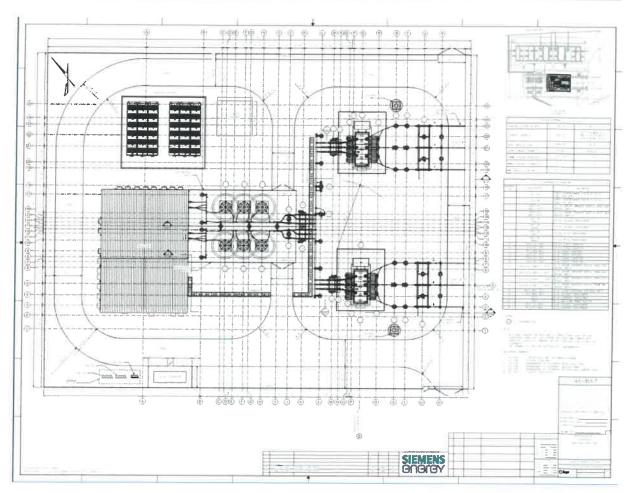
Equipment Arrangement Plan Drawing of Solley Rd STATCOM Unit (Drawing #621756E [01/10/2025])
